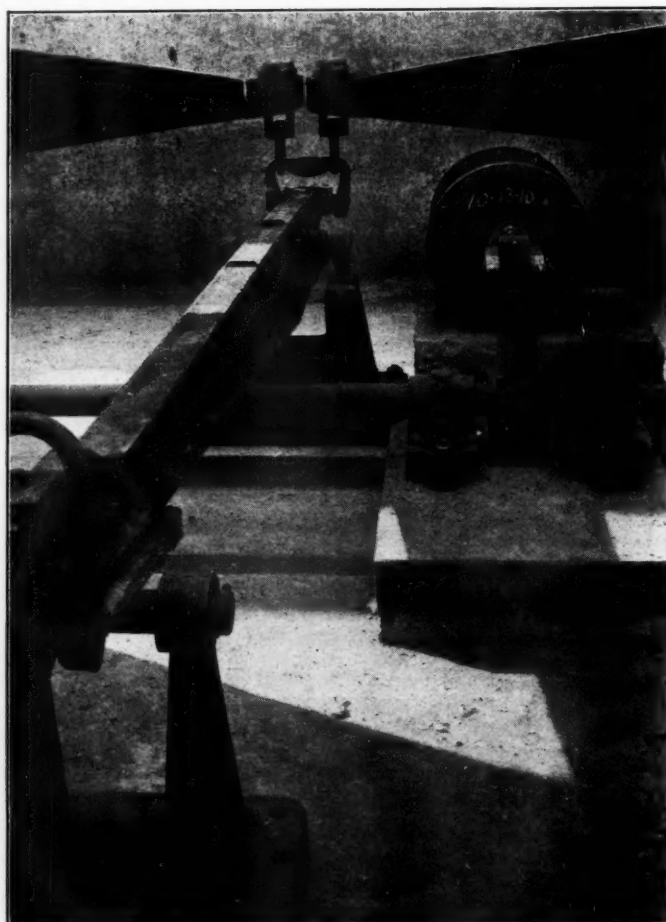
Cylinder and Torsion Shaft for Operating Relieving Gear; Also Middle Extension Levers Connected
